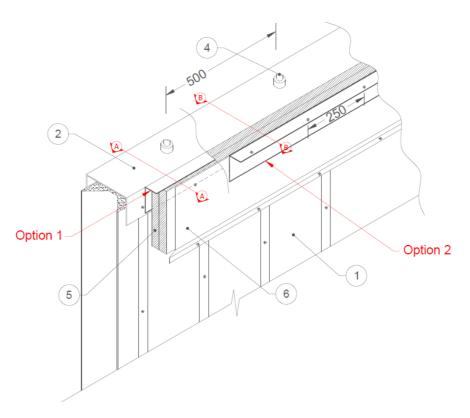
Head Detail B – Protected One Side with Two Layers of 16mm thick Fire Grad Plasterboard
